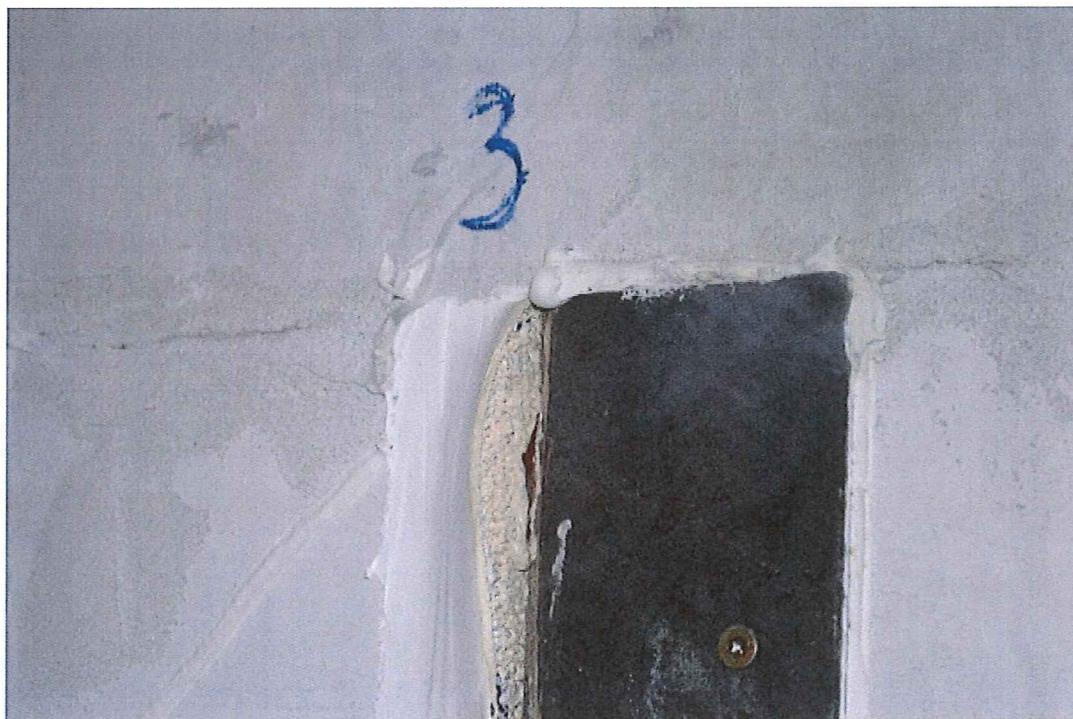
Integrity failure at the top of joint seal 3 after 57 minutes of testing
